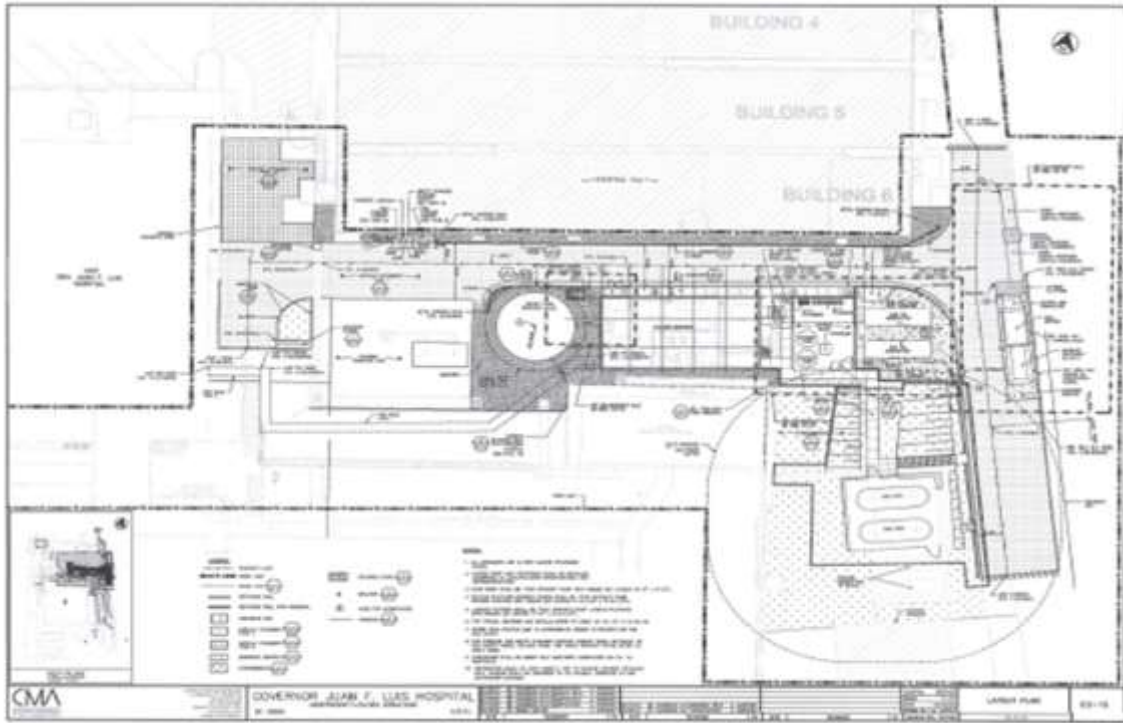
of 5: Proposed Mechanical Utility Building and Support Structures Schematic & Aerial Layout
